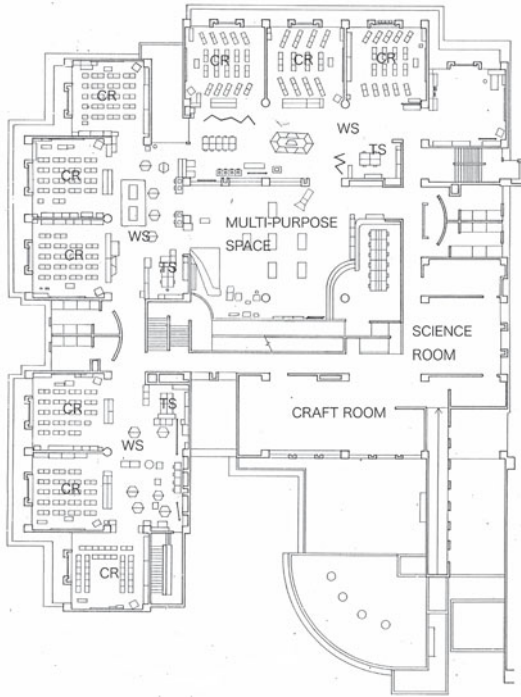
Floor plan of Honcho Elementary School, Kanagawa.
